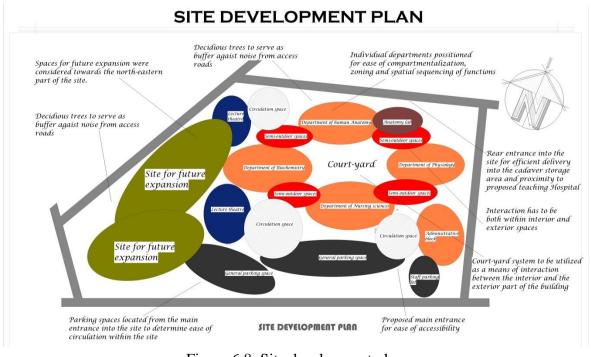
Site development plan. Source: Author's sketch, 2017
